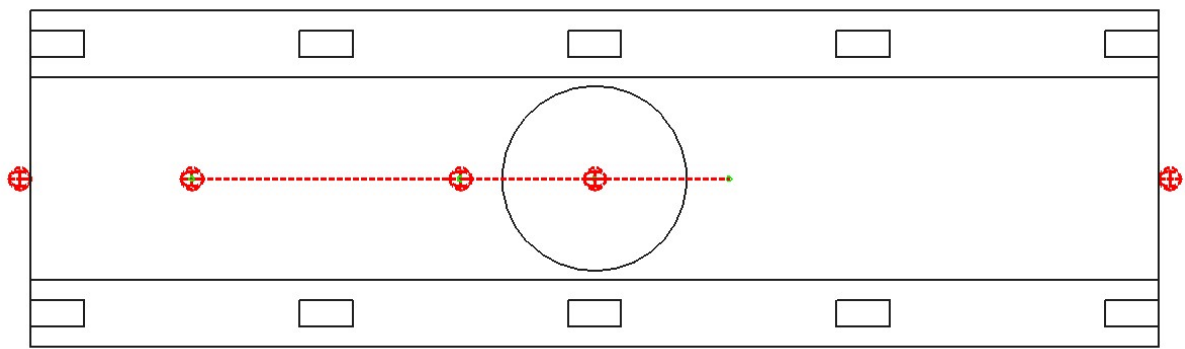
Plan View of Cap Beam Twist and Dilation Instrumentation Scheme
